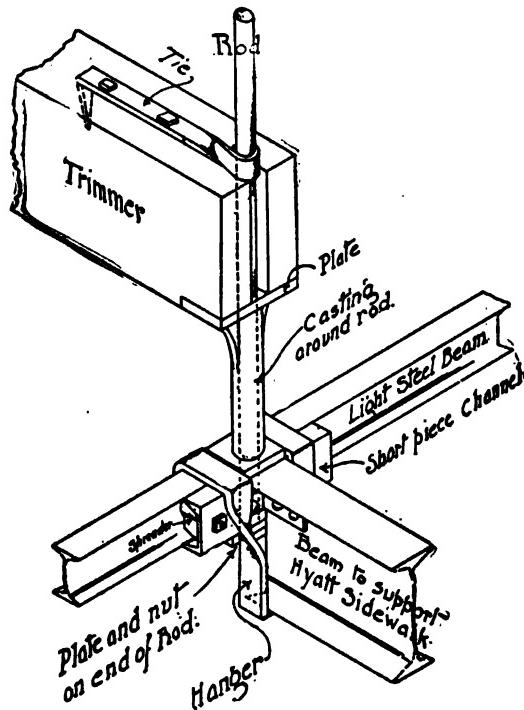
Detail of Framing of First Floor and Sidewalk, "Youth's Companion" Building, Boston, Mass.
